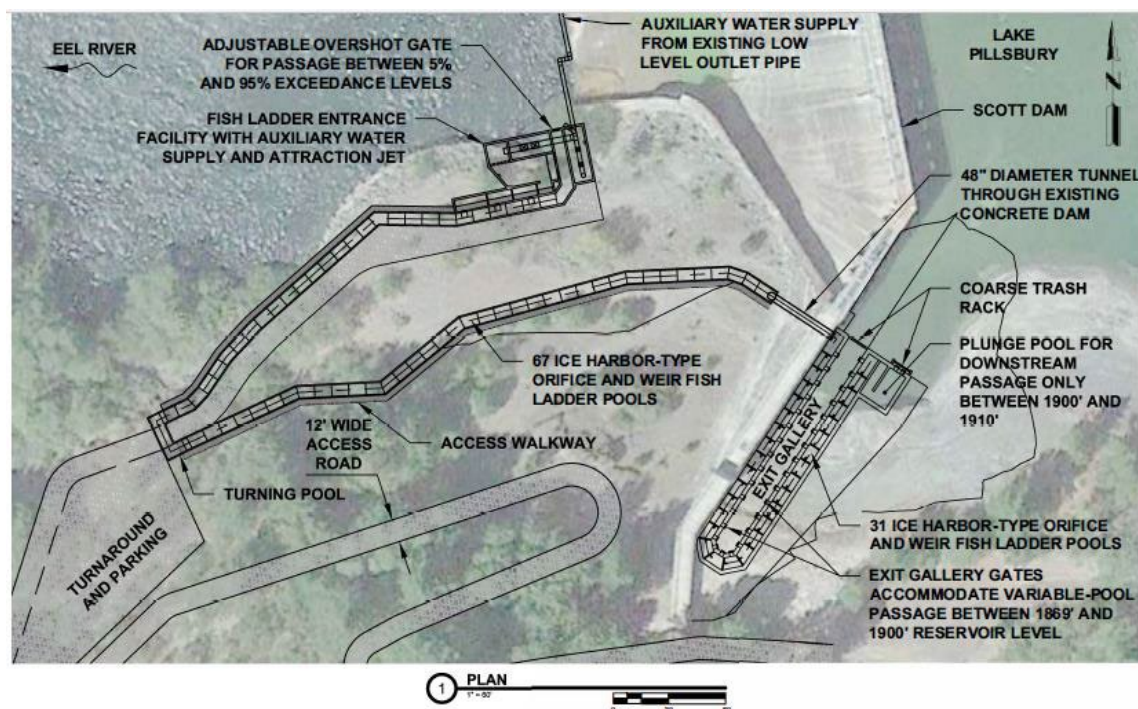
Mead & Hunt (2018) Modified Conventional Fishway Alternative for Scott Dam.
